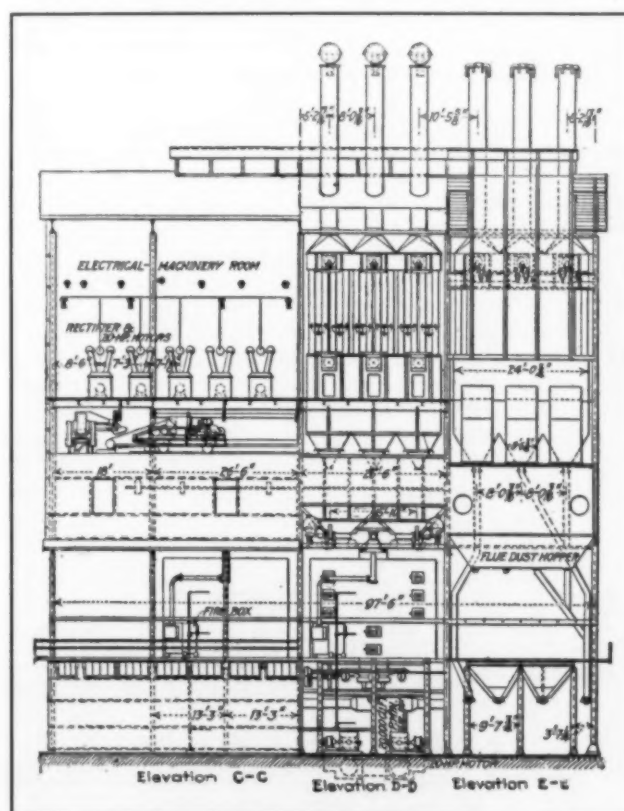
SIDE ELEVATION OF ROASTER AND DRYER PLANT, INTERNATIONAL SMELTING CO.
